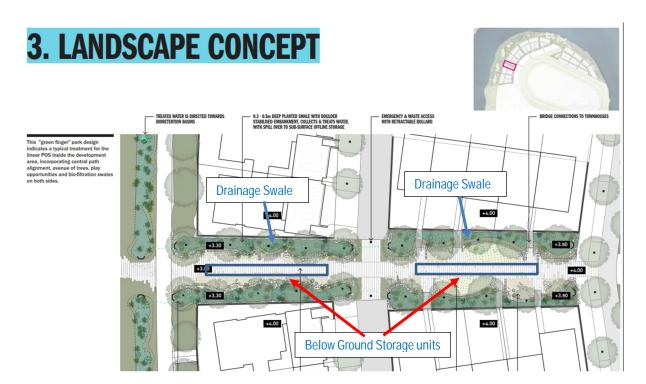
Stormwater Drainage Swales and Biofiltration & Storage Zones (POS Green Fingers)
